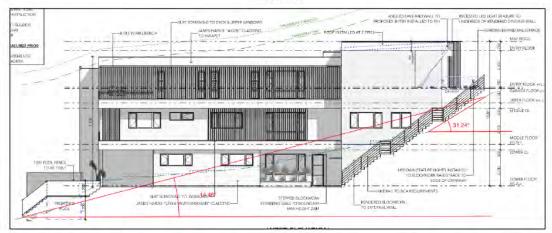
Elevation plan showing the slope of the site across the building envelope (14.46°) and the slope of the steepest section (31.24°)
